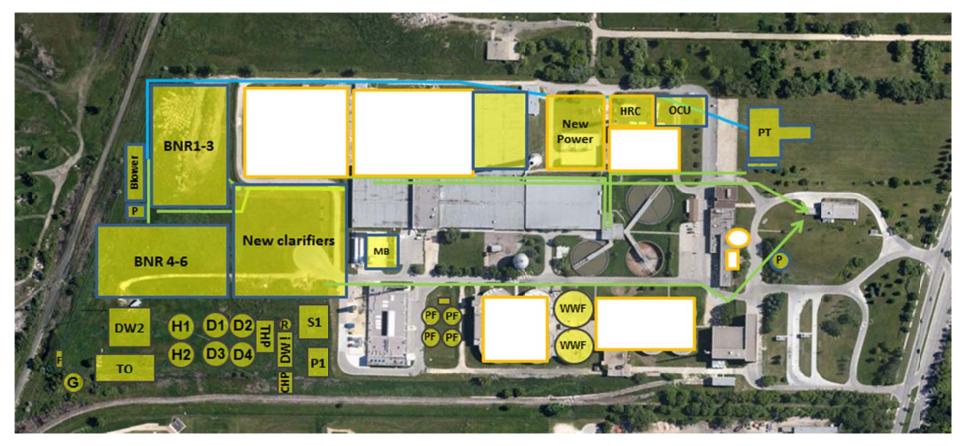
Potential layout of the NEWPCC with BNR and new digestion facility
